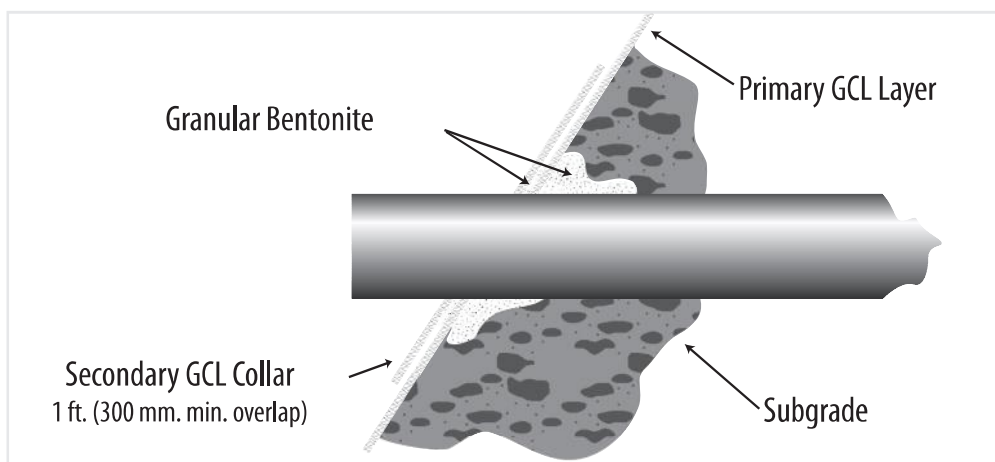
B ISOMETRIC VIEW OF A COMPLETED HORIZONTAL PIPE PENETRATION
